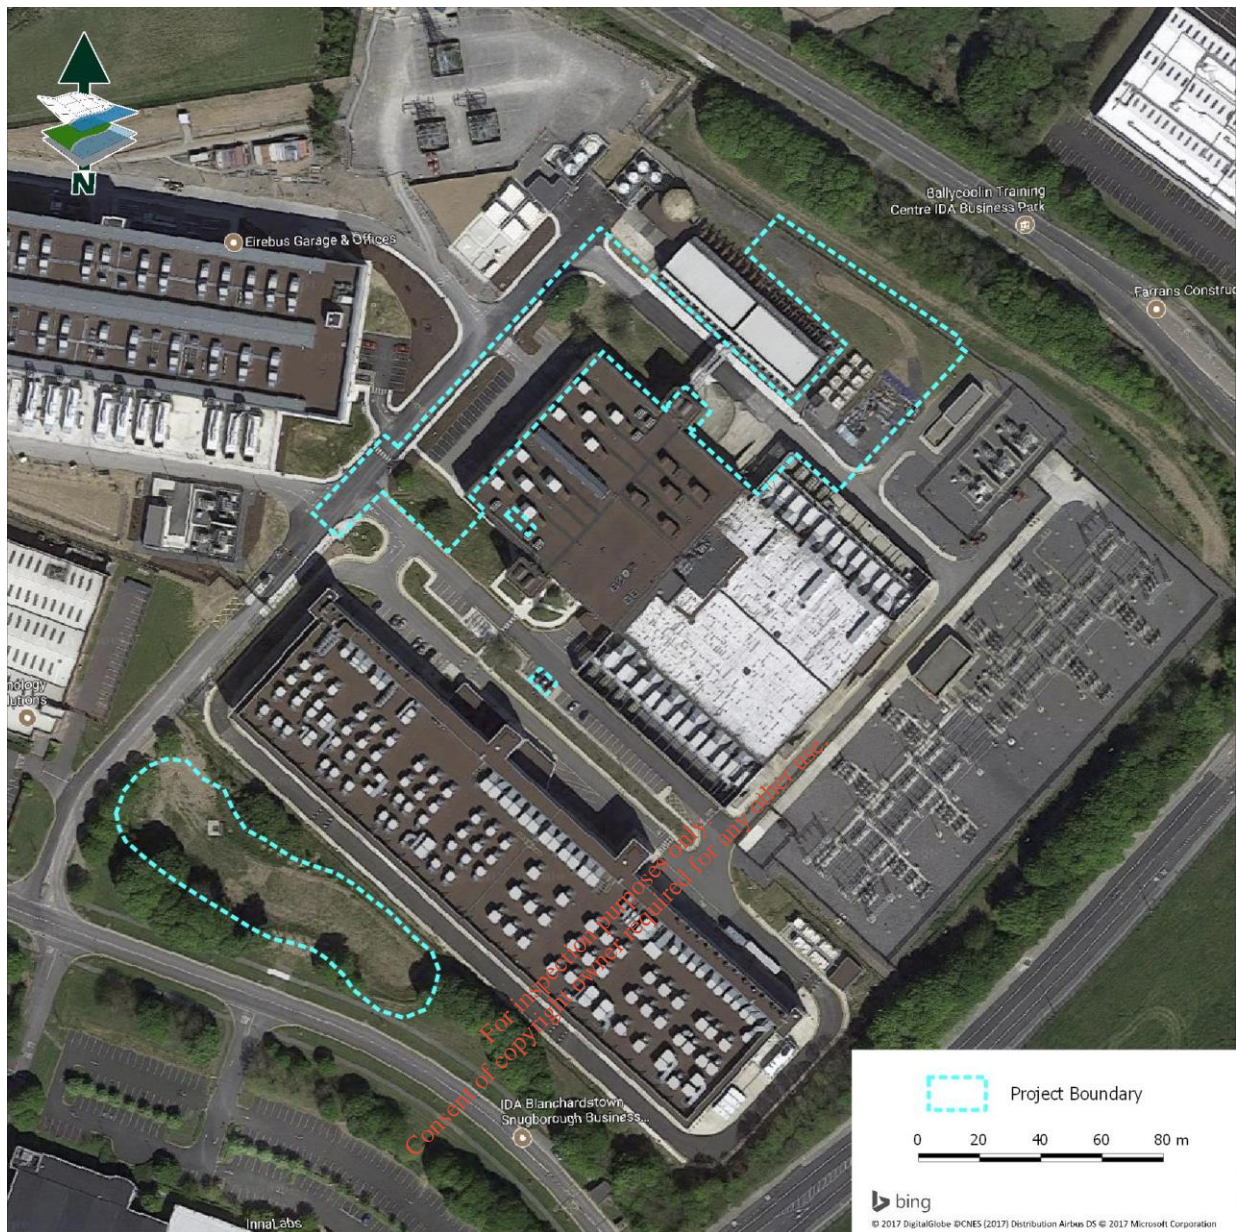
Detailed view of the existing site and proposed application boundary outlined.
